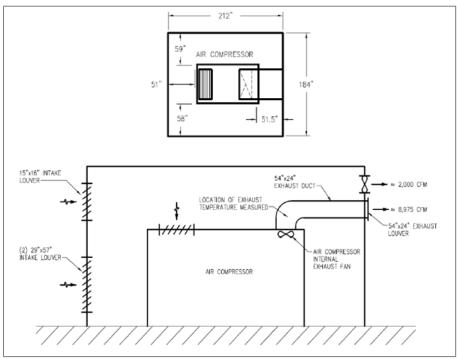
Existing Compressor Building Configuration. The top figure shows a plan view of the compressor building, including service clearances and building dimensions. The lower figure shows a side view of the compressor building, illustrating the relative location of the intake louvers and exhaust fan (Eaton, 2012).
